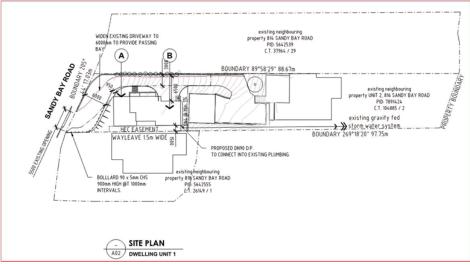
Proposed Site Plan showing the proposed works to driveway and location of the dwelling extension
